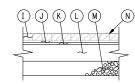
# DETAIL 'E' REPAIRING PAVEMENT OPENINGS FOR UTILITY TRENCHES
